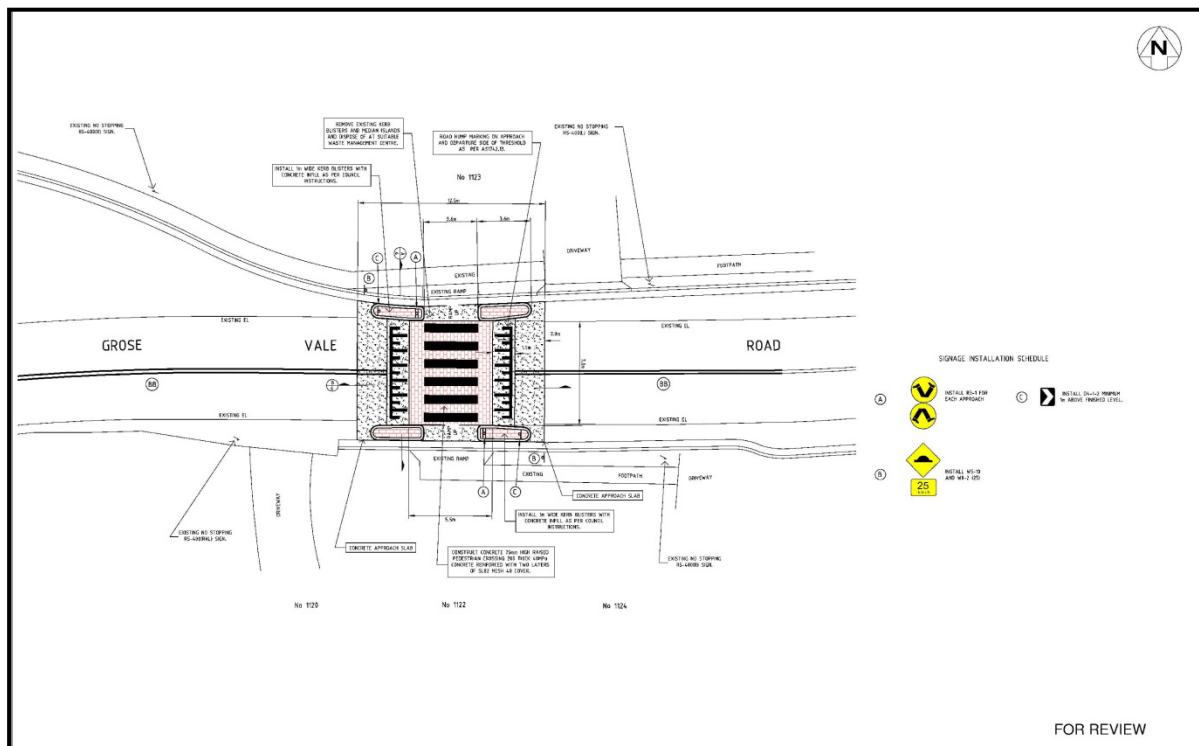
Site 2 – Proposed Raised Wombat Pedestrian Crossing
